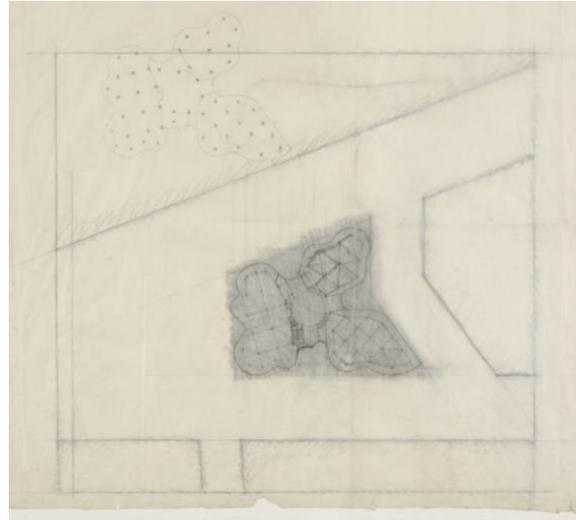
, Mies, Glass Skyscraper Project, Sketch Plan & Structural Grid, 1922⁶⁵
